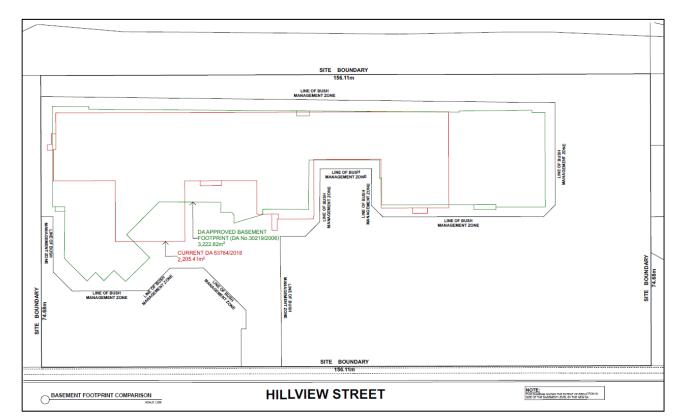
Footprint Comparison Approved DA with Proposed DA - Site Plan
